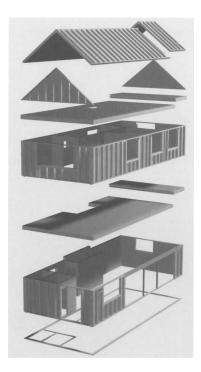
Exploded view showing individual structural elements (from [39]).
